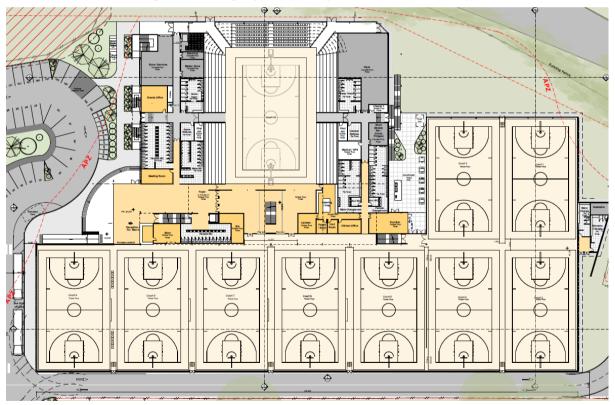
Ground Floor Plan (Source: BKA Architecture)
